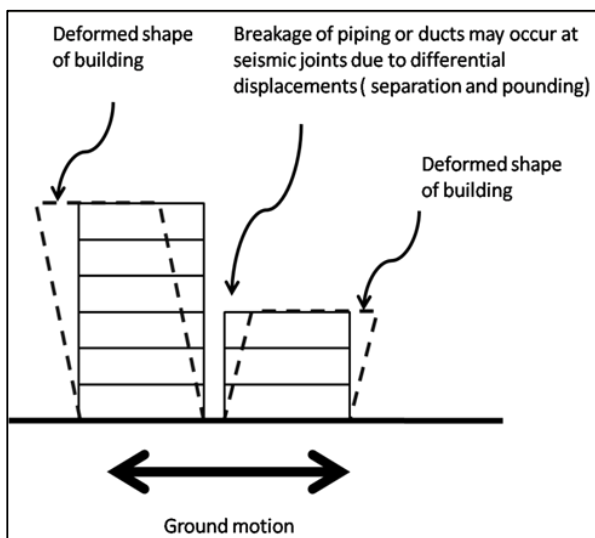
Nonstructural damage due to separation and pounding.
